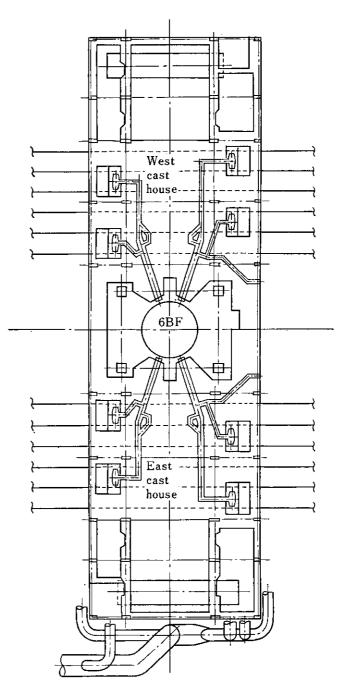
Cast house layout of Chiba No.6 blast furnace
